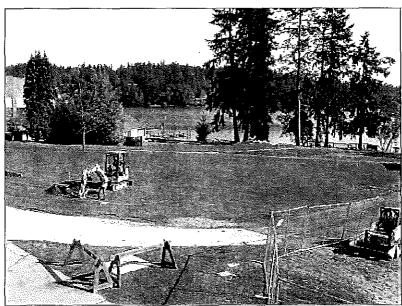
View northeast across development area showing backhoe testing. Note the existing house in the far left corner of the development area.
